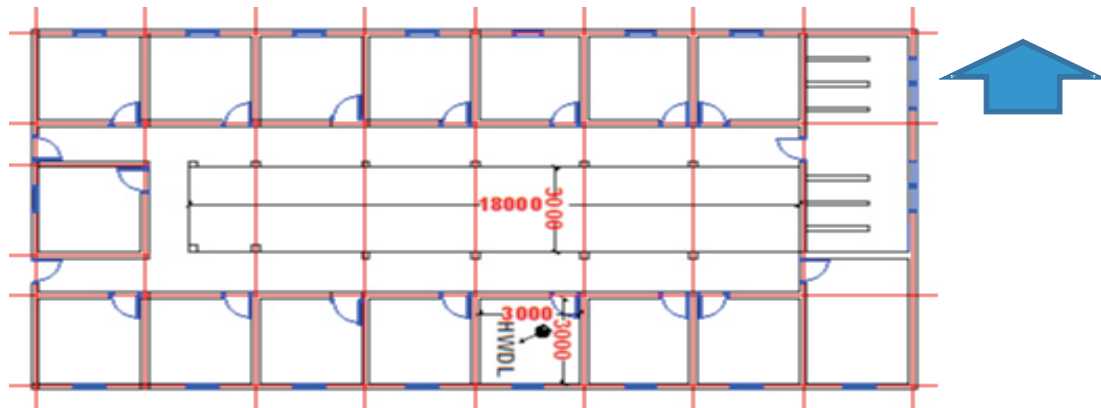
Floor Plan of the Case-Study Building Showing the HWDL in the Test-room
